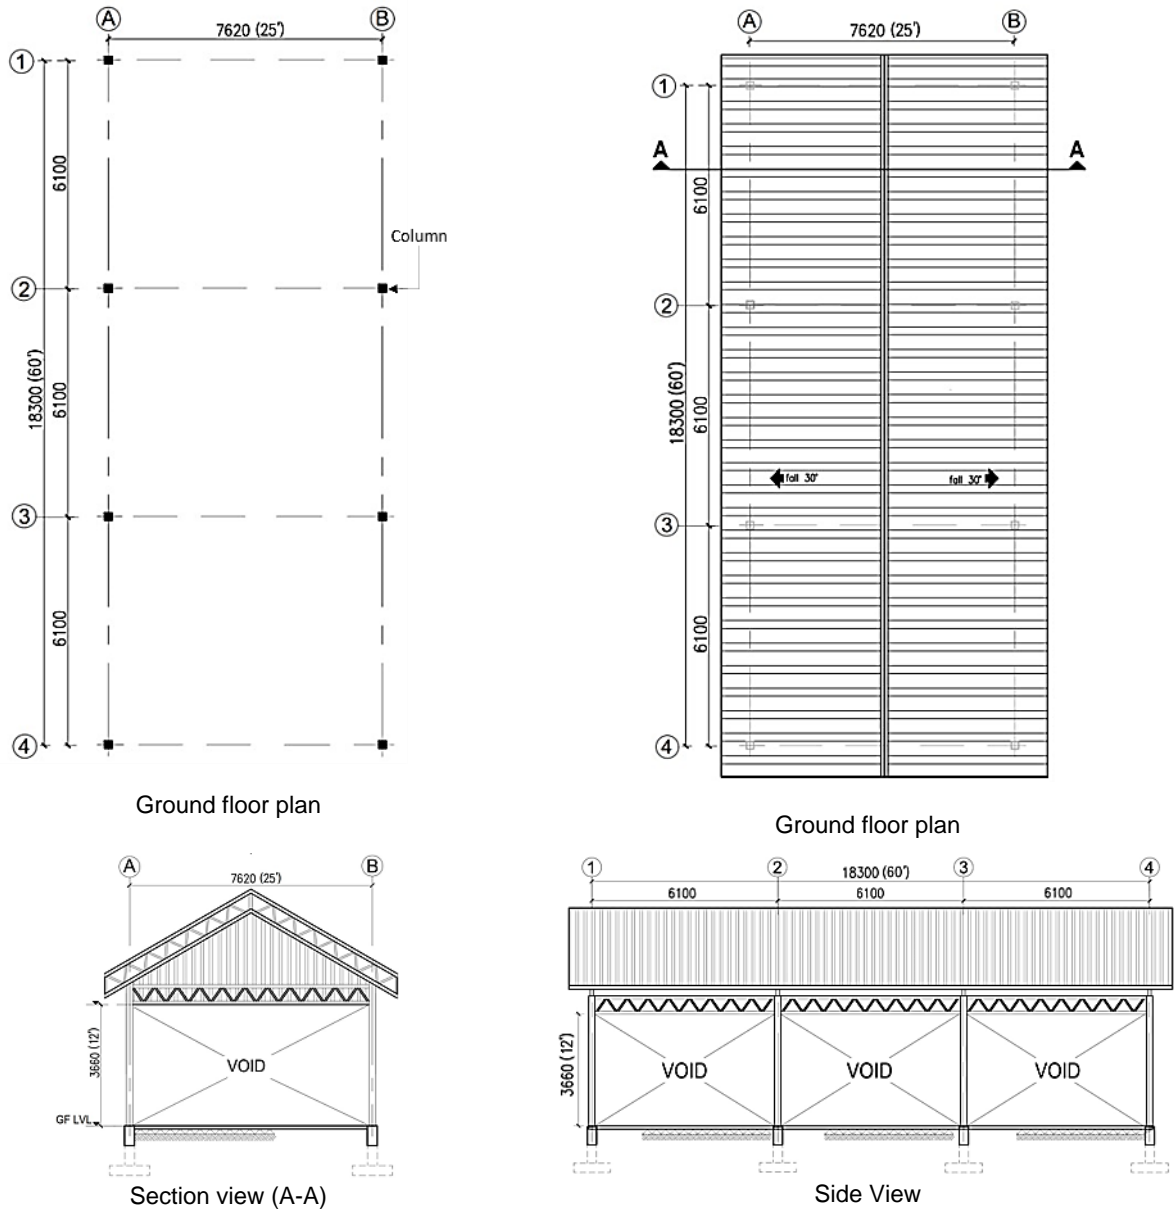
Typical Plan Layout and View for Open Hall (Building without Wall)
